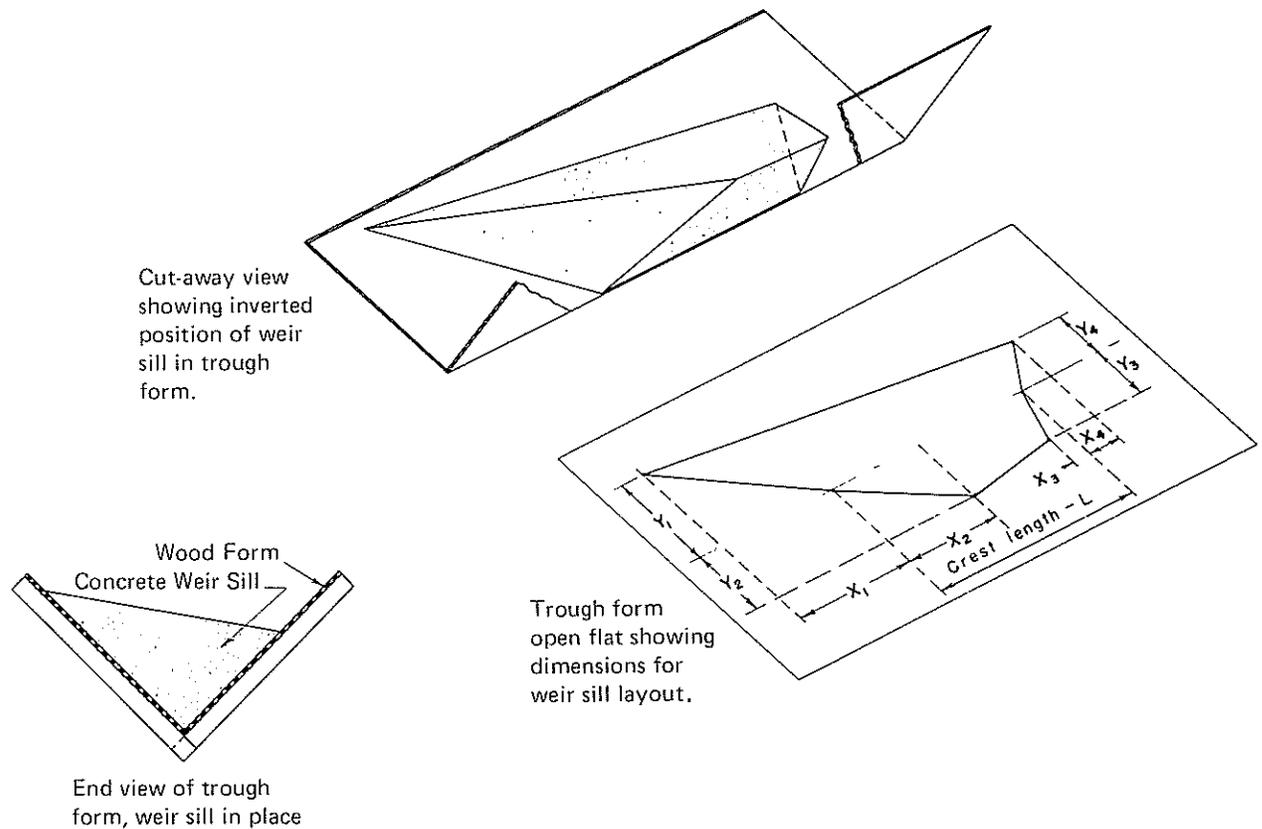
Vilemonte weir sill showing details of right-angle trough for casting concrete sills.
